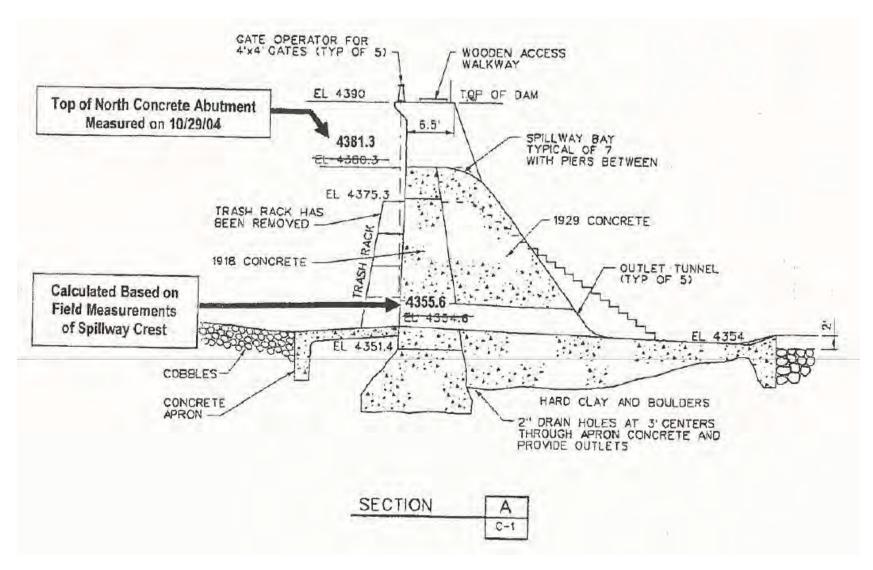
Cross-section of Wallowa Lake Dam (MWH, 2002).
